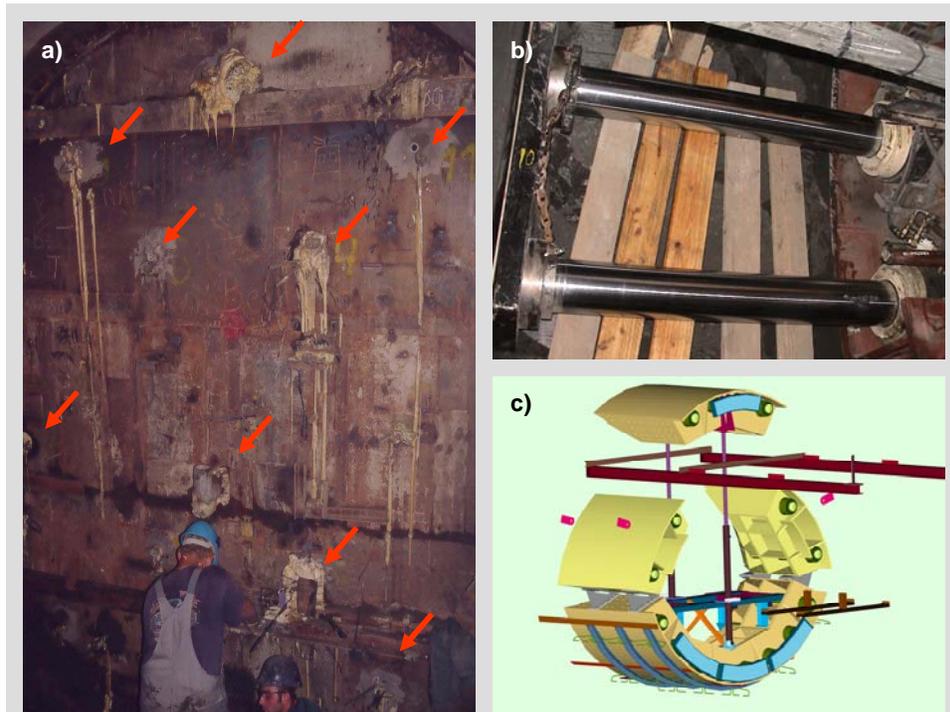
Some of the safety measures taken during excavation. a) Anchoring of the front of the northern starting chamber; b) Timbering placed between the jacks and the sidewall to prevent clay blocks from coming off; c) One of the many illustrations of the storyboard of the shield assembly (SCM Tunnel).
